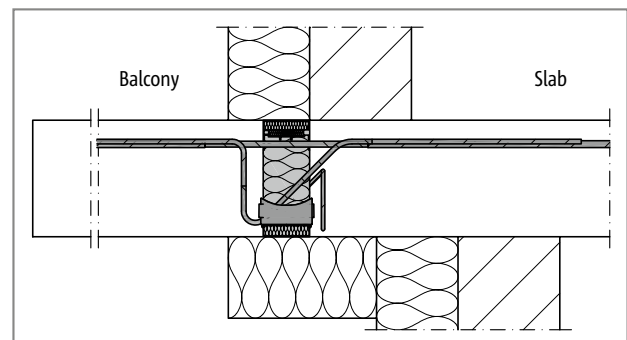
Schöck Isokorb® T type K-E, K-T: Connection for an indirectly supported floor and WDVS
